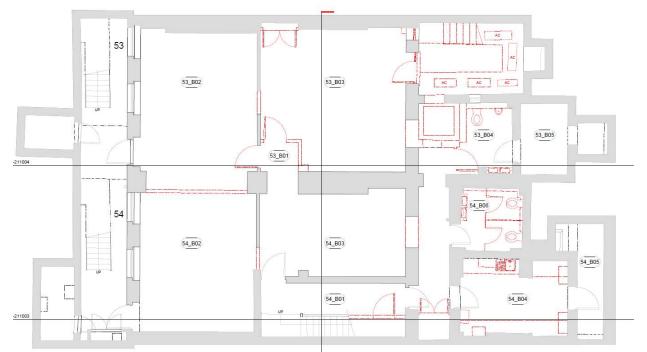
Basement plan showing proposed demolition in red (No. 53 top and 54 bottom).
